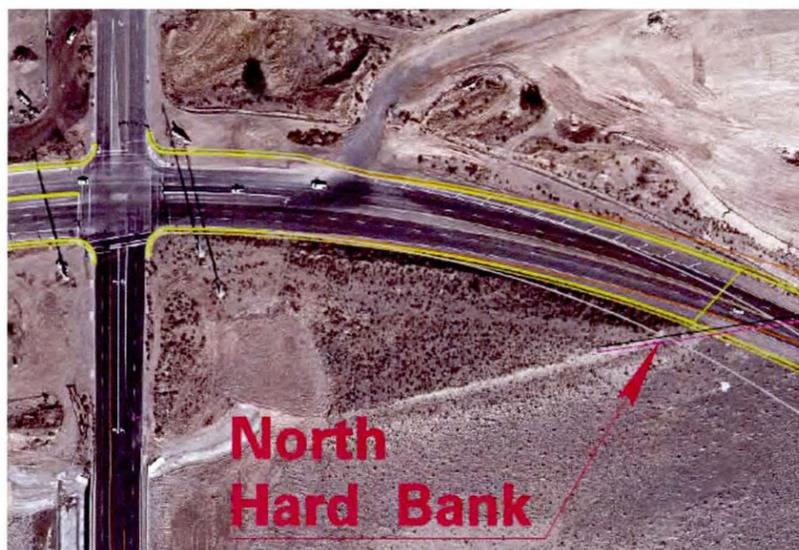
Mckellips Bridge tie-in to Mckellips Road at Alma School Road
